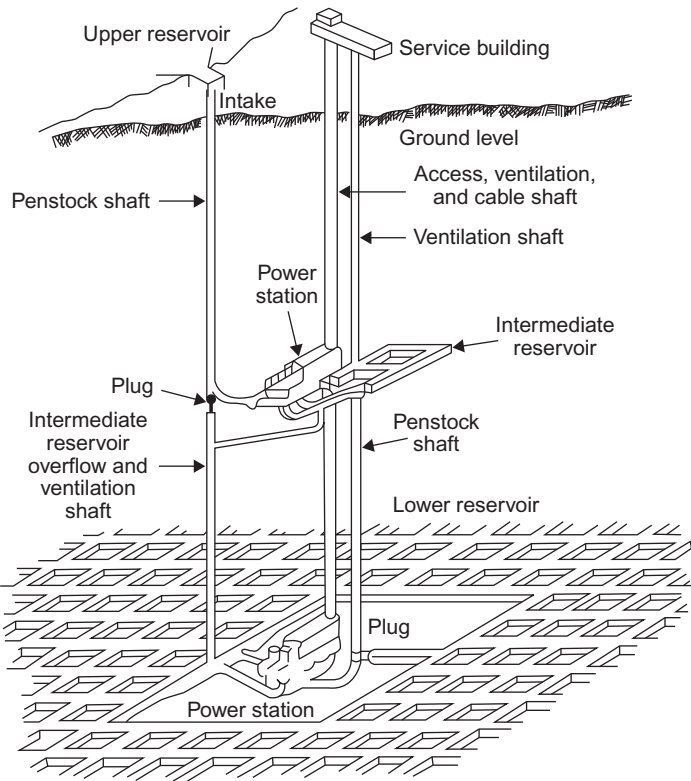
Schematic layout of underground pumped hydro storage system.
